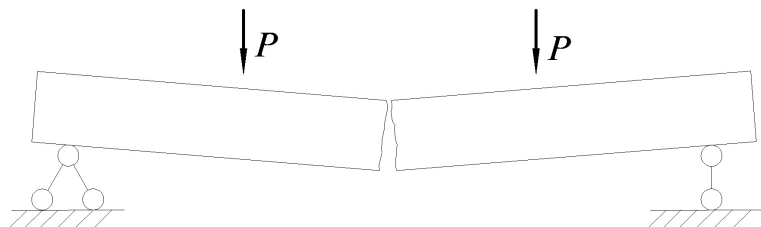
Illustration of the bending failure of plain concrete beam
